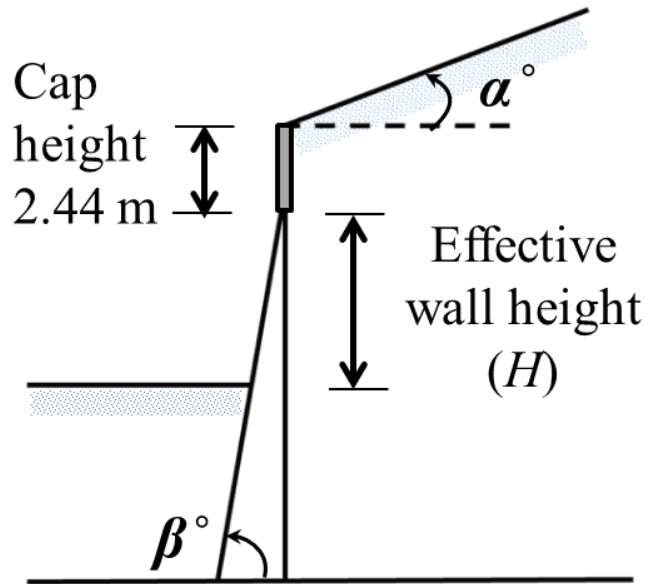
Definition of “effective” wall height, wall inclination and backfill slope.
